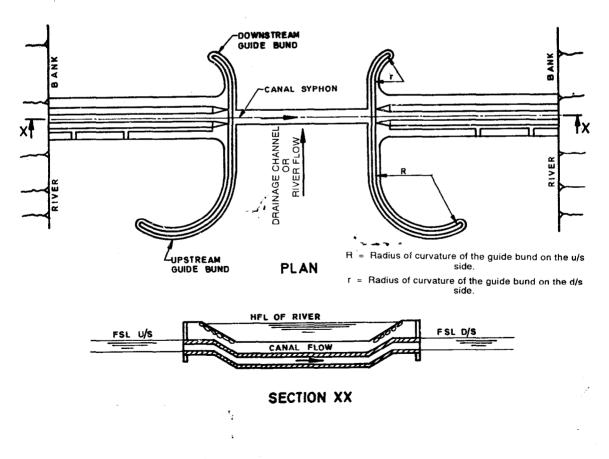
TYPICAL PLAN OF DRAINAGE FLUMING
